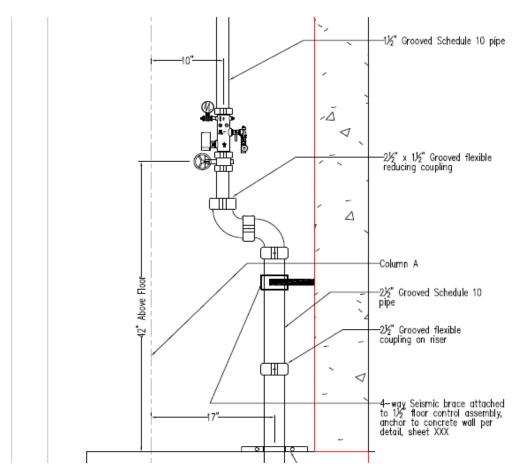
Floors 5 control assembly detailed drawing (looking north)
